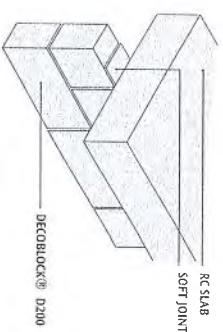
Junction of Non Load bearing Wall with Concrete Slab-without Head Restraint
